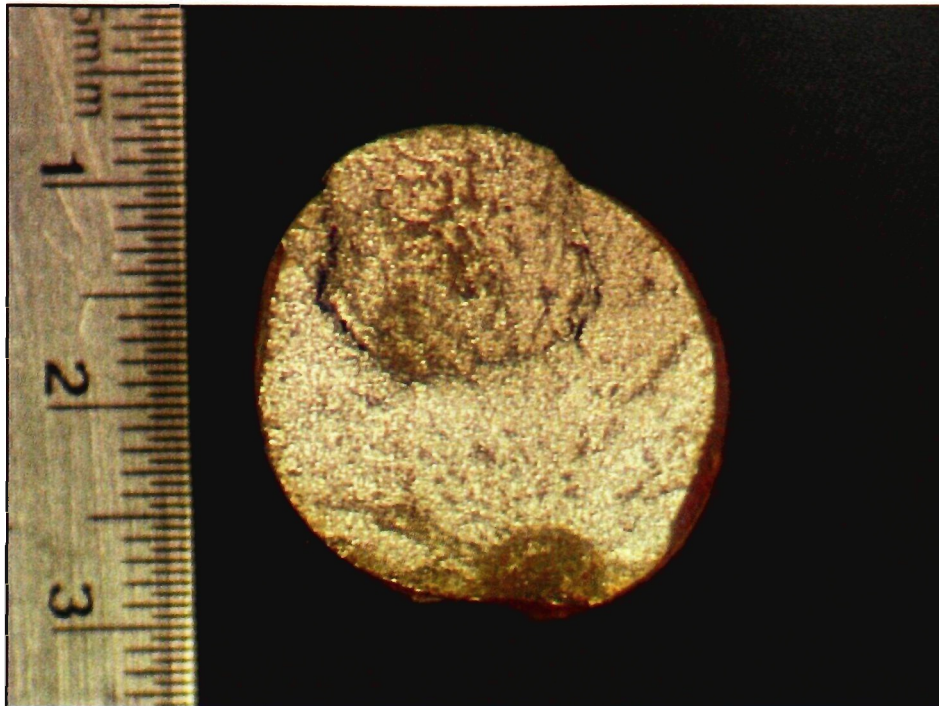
Macroscopic view of rock bolt's fracture surface
